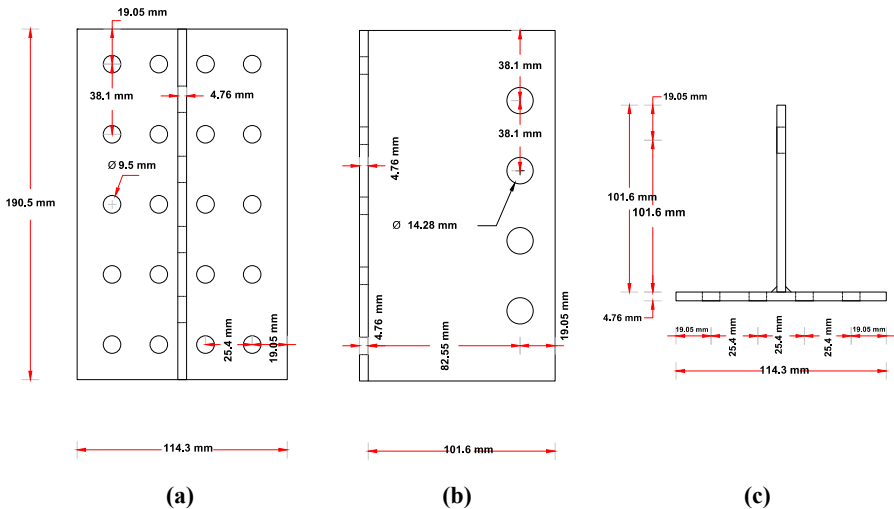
Geometry of T-shape welded steel connection; (a) front view, (b) side view and (c) top view
